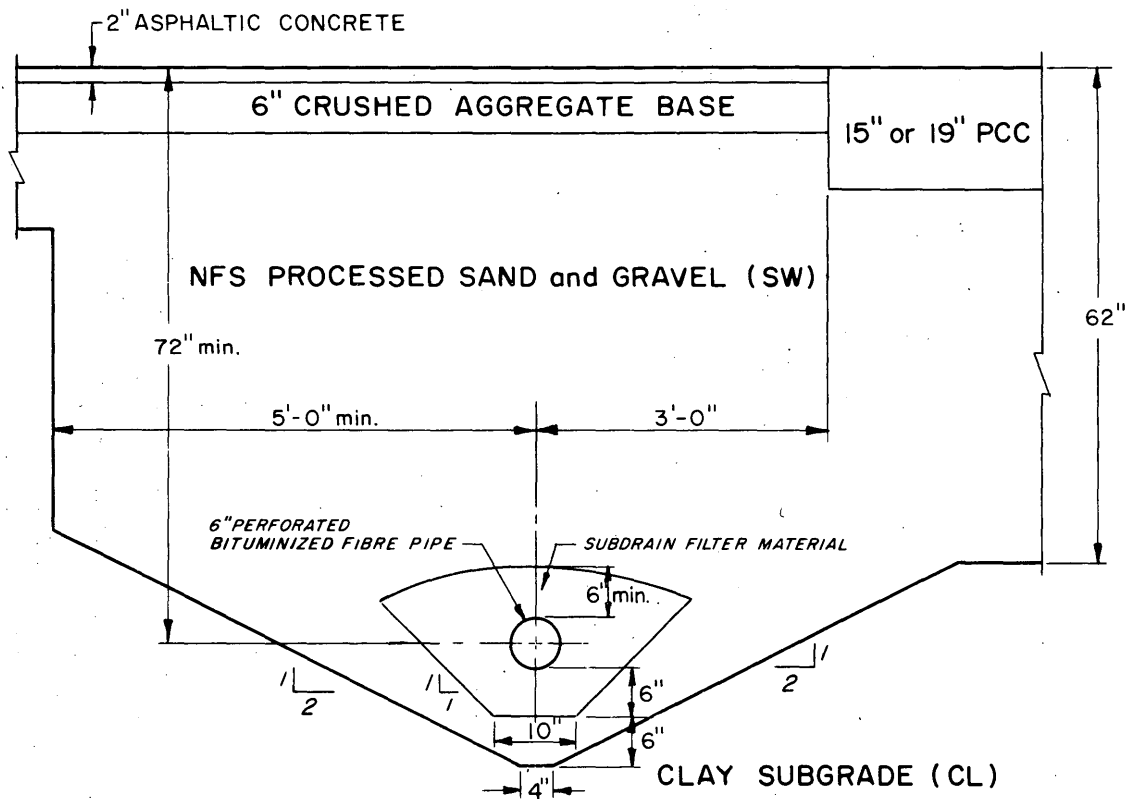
Subsurface drainage observational locations, heavy load apron extension, Dow AFB.
